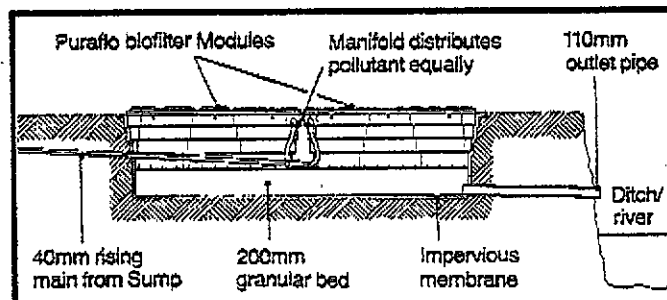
(a) Puraflo system discharging treated effluent into open ditch, stream or river
